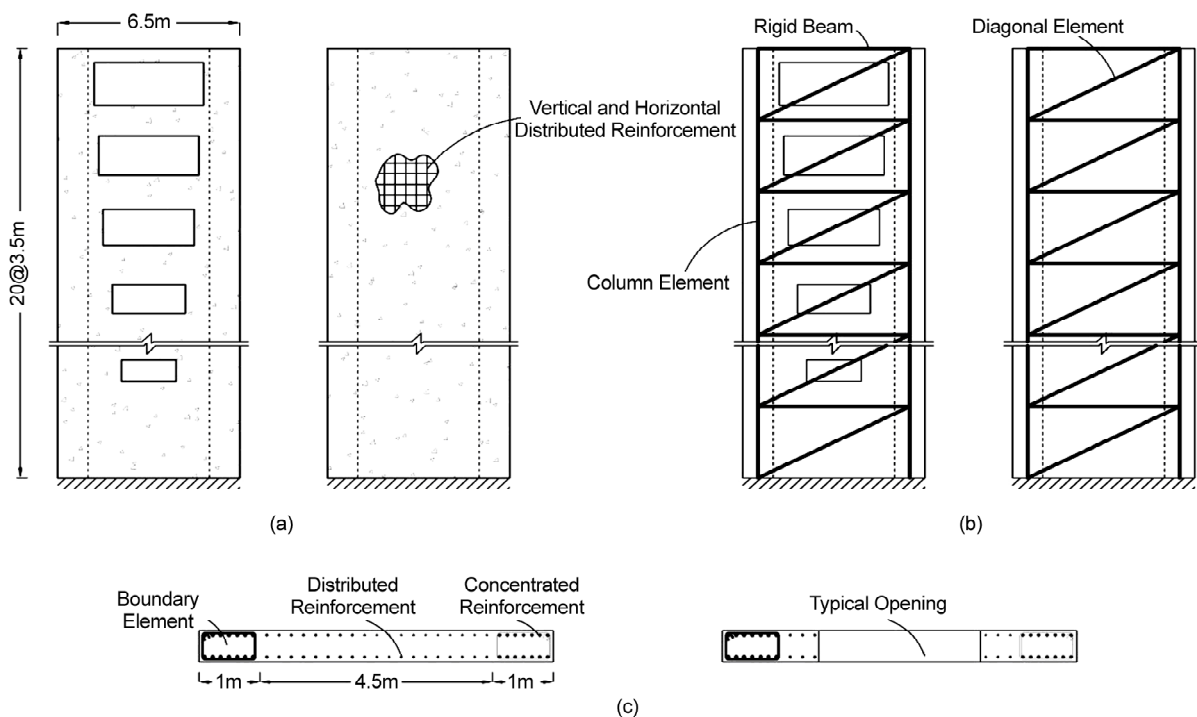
Properties of shear walls; (a): Geometric; (b): simple truss model; (c) typical wall section and reinforcement details.
